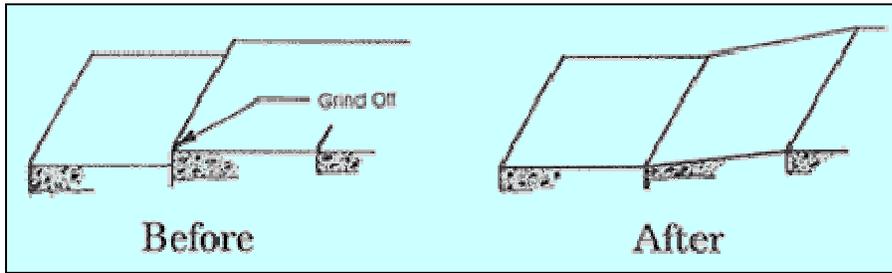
Portland, OR's Sidewalk Repair Manual shows “before” and “after”.
